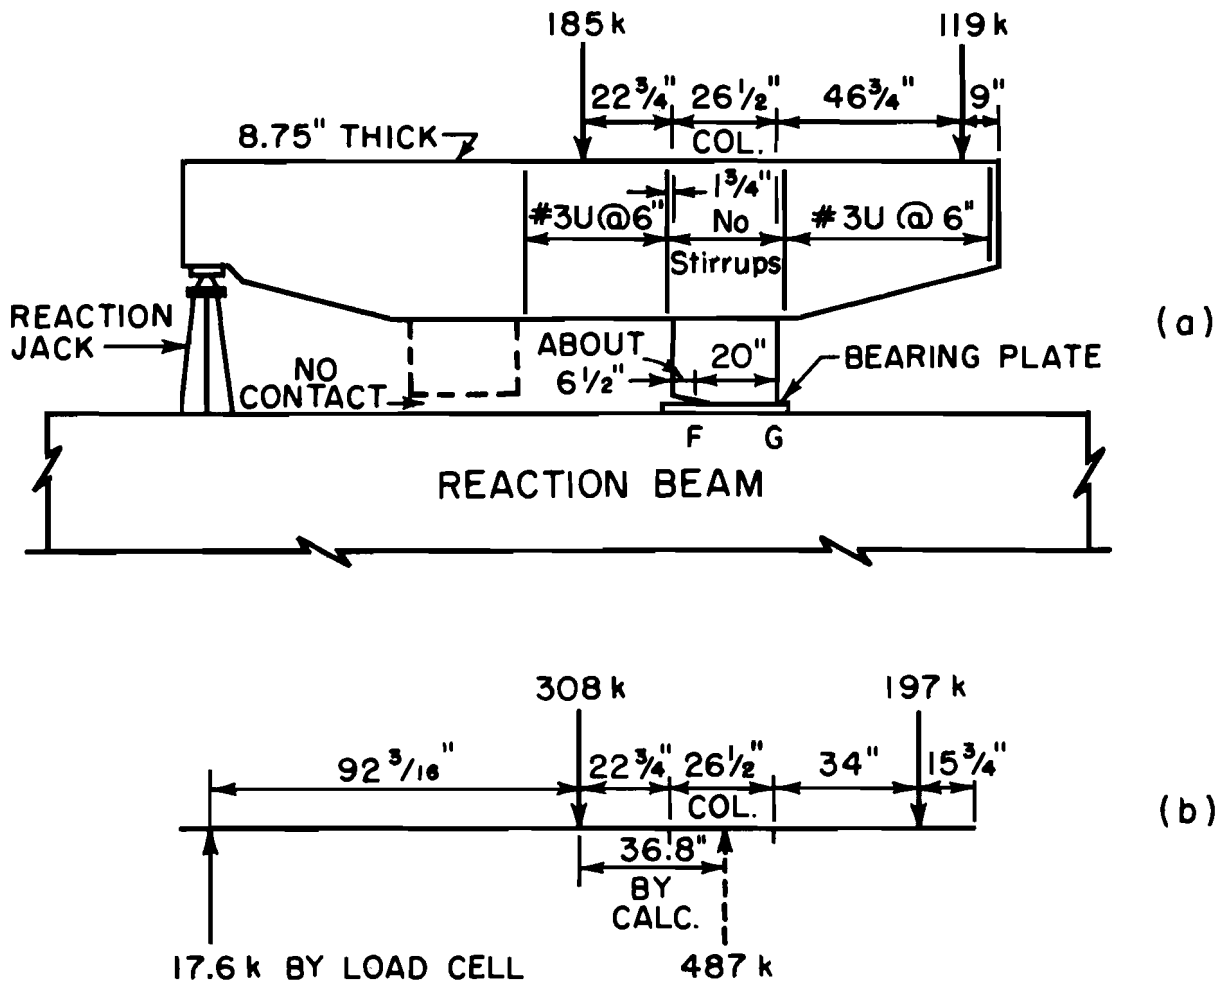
TEST WITH INTERIOR LOAD. (a) SPECIMEN 25-4-V-4. (b) SPECIMEN 34-3-V-4.
